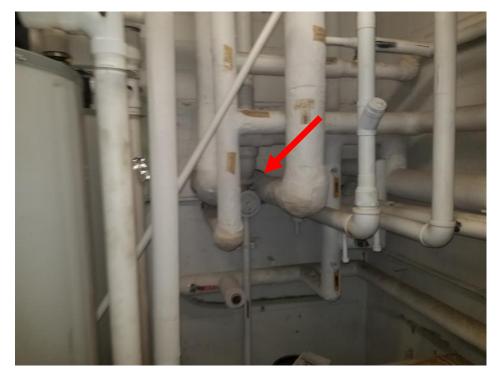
Basement, mechanical room B23, along north wall at bottom of stairs, <1 linear metre poor condition Aircell.
